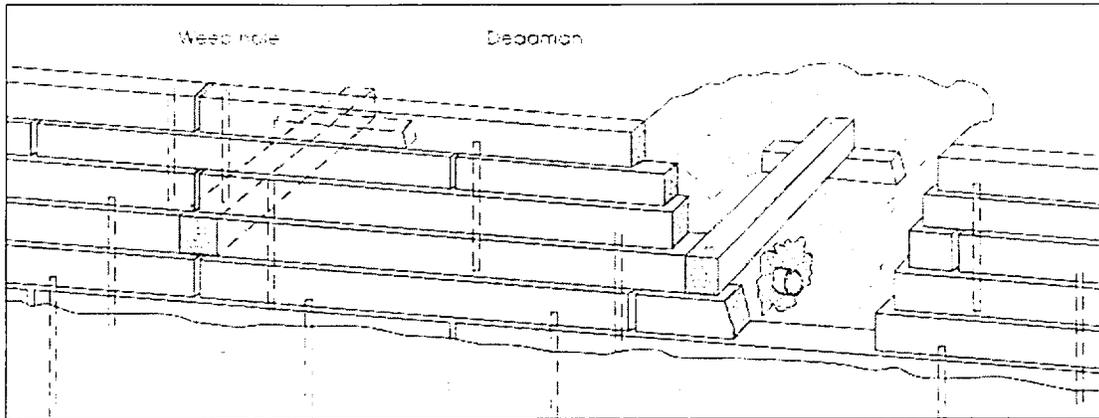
Schematic sketch showing a standard edge fastened retaining wall with perpendicular “dead man” anchors (Hufnagel 2000:403).
